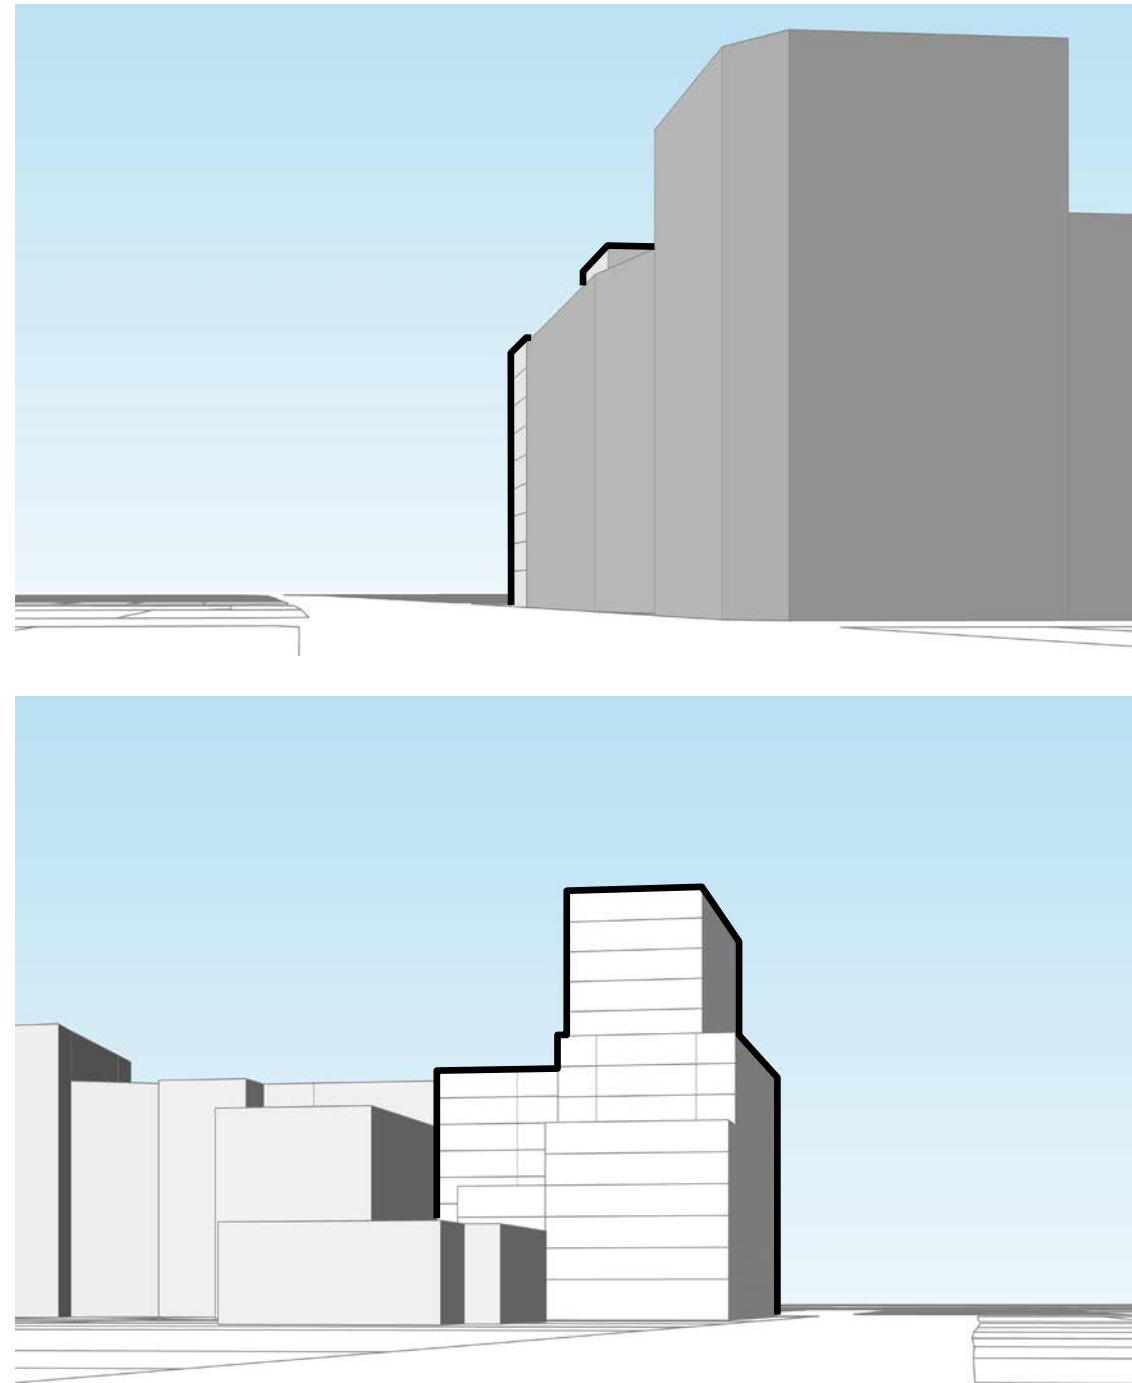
Option 2: Eye-level View from Parramatta Road (top) and Bridge Road (bottom)
